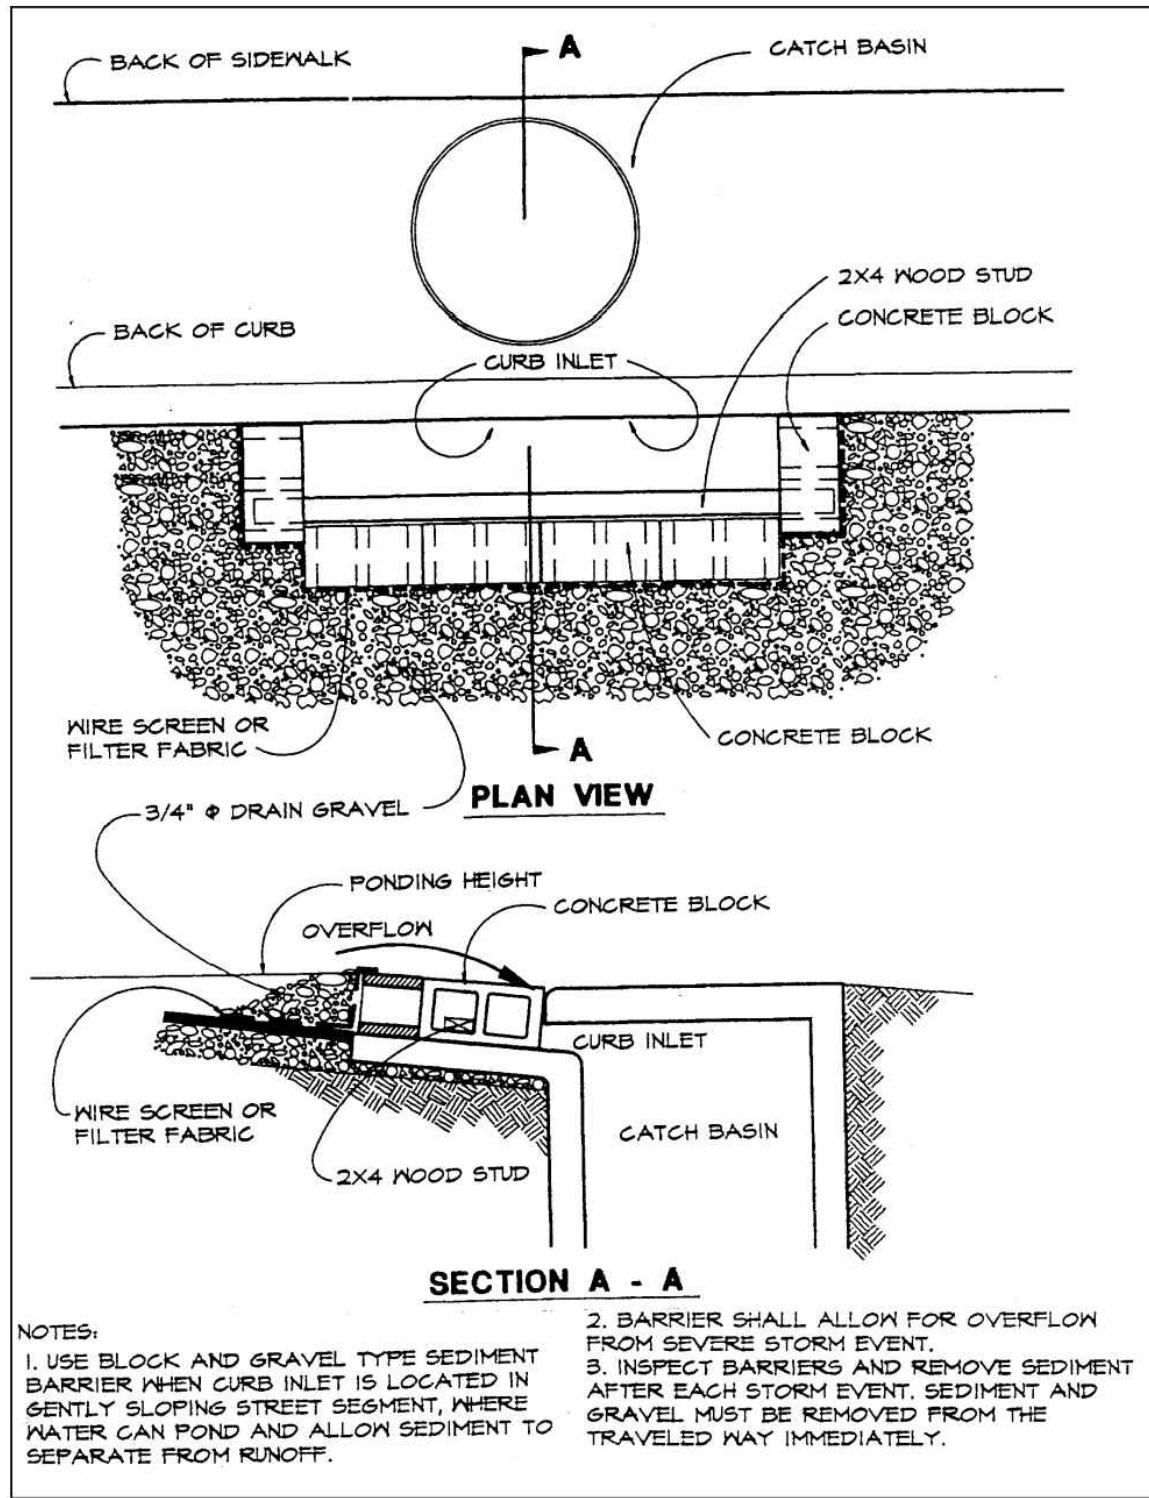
Block and Gravel Curb Inlet Sediment Barrier
